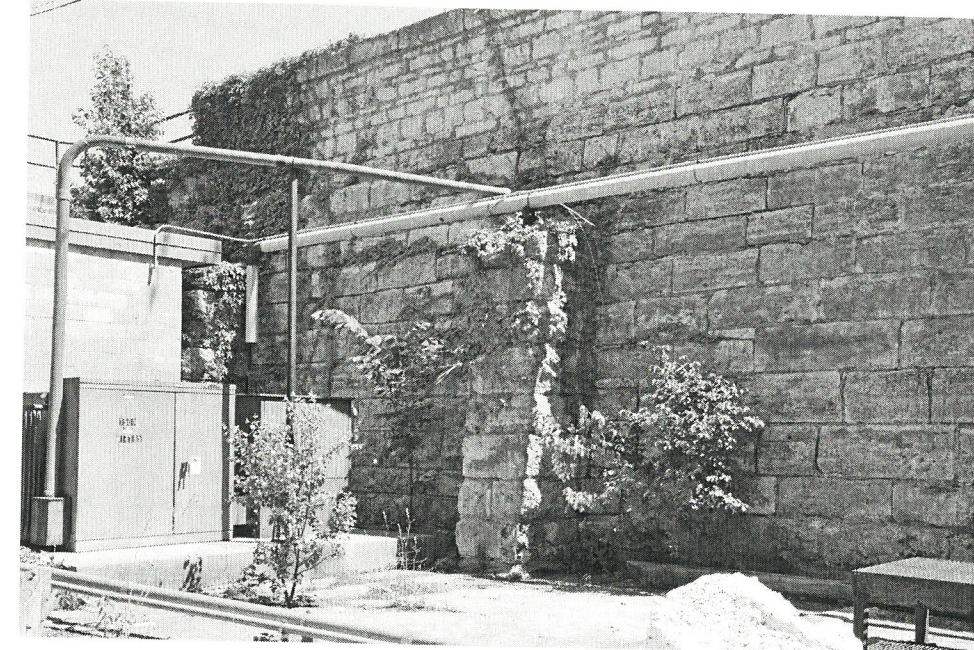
102 Broad St. Red Wing Malting Company, buttressed limestone retaining wall aligned east-west along the south edge of the property (facing SE)
